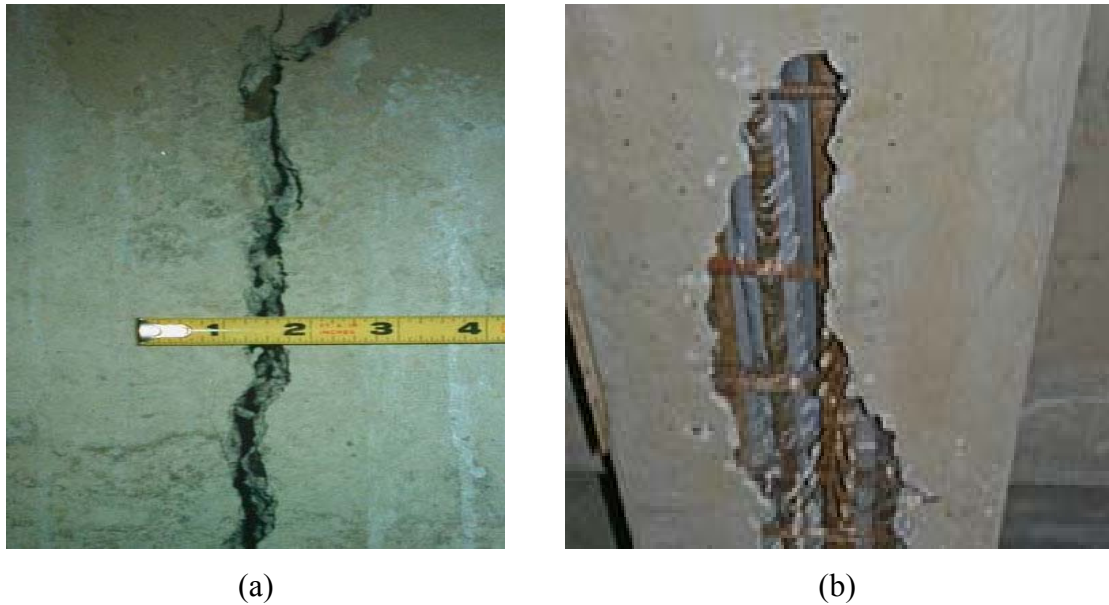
(a) Crack and (b) honeycomb damage in reinforced concrete structures
